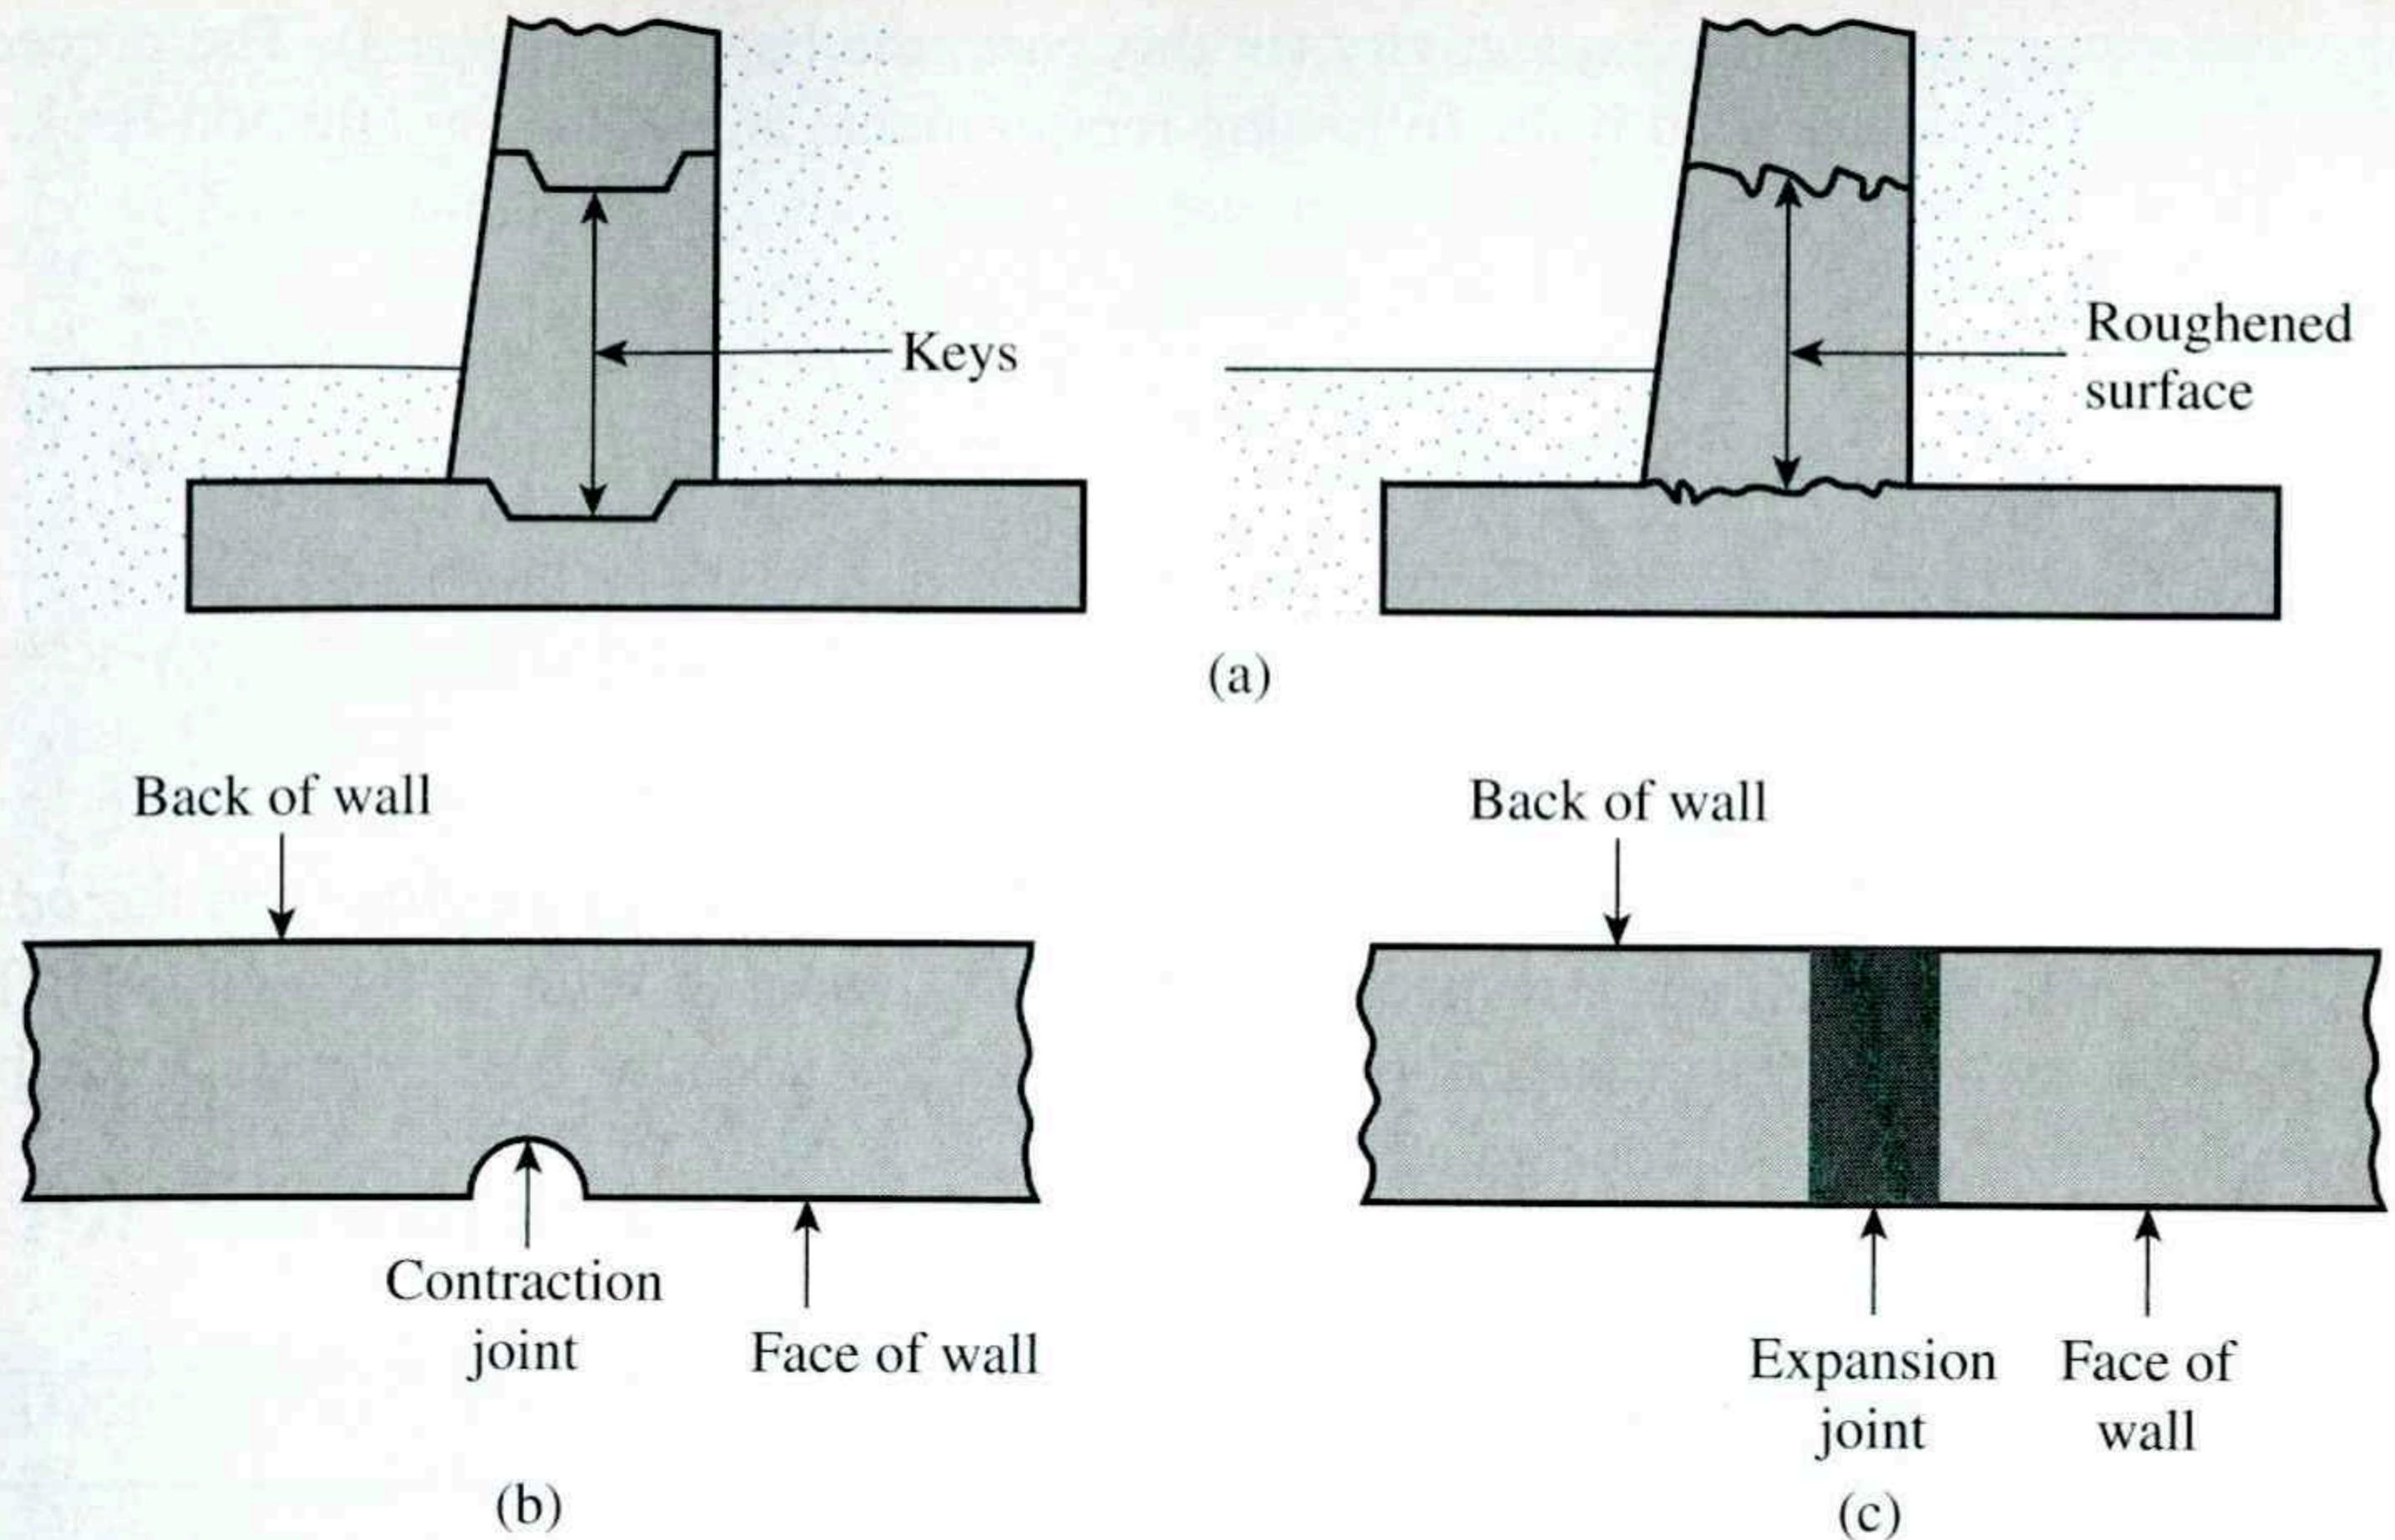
(a) Construction joints; (b) contraction joint; (c) expansion joint
